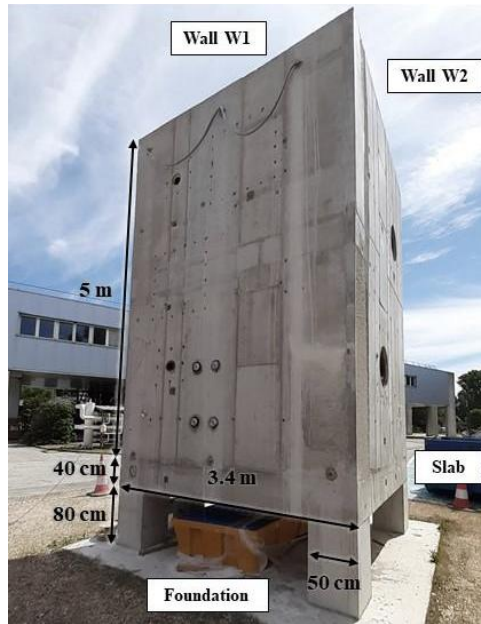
Reinforced concrete structure at the testing facility of EDF TEGG.
